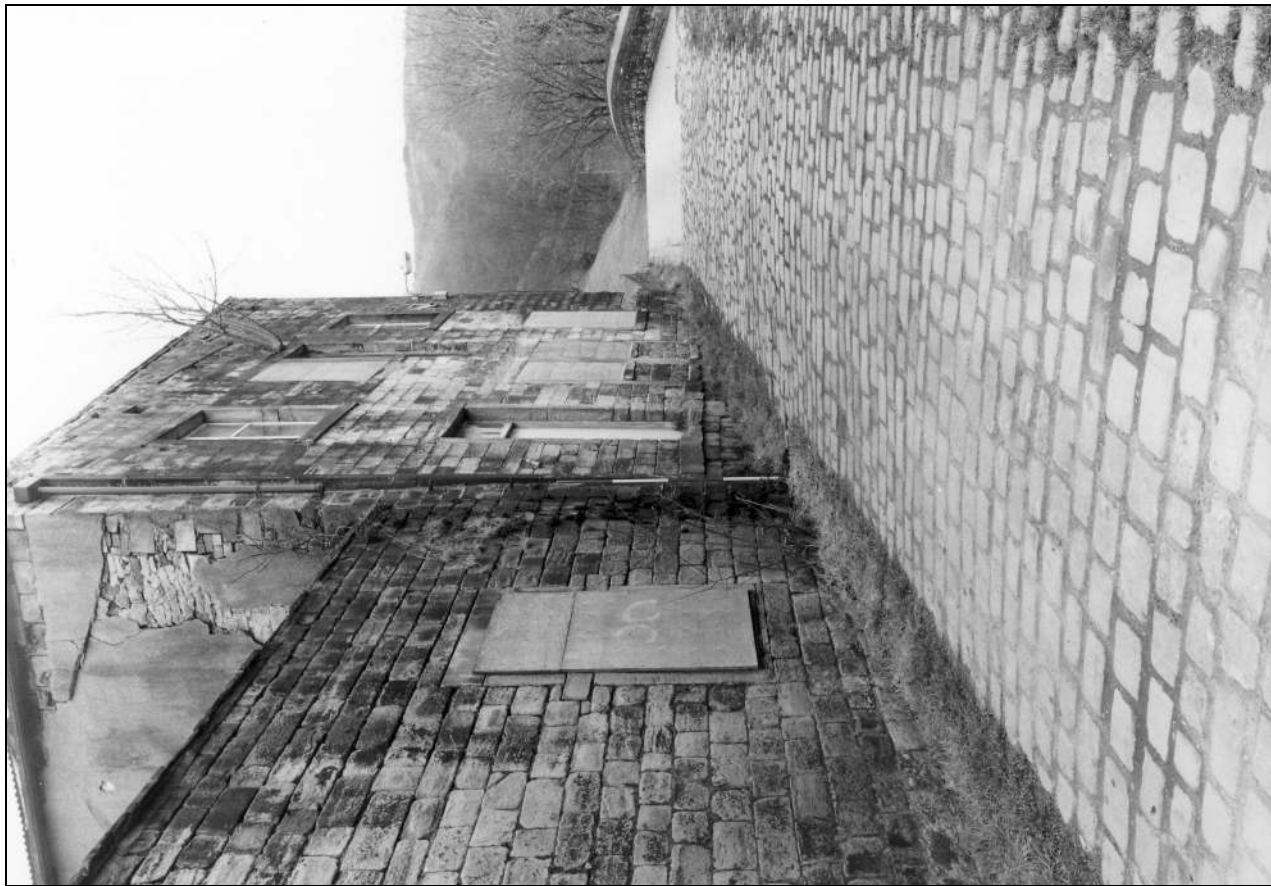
East elevation of spinning mill, from the south-east (film 9, frame 3)
